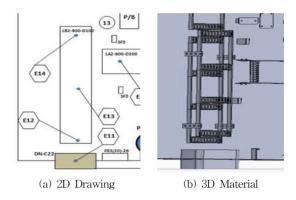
a) 2D Installation Drawing b) 3D Training Material
